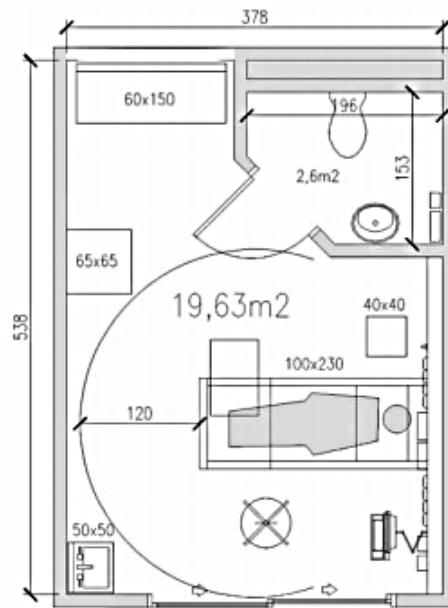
Floor plan of a single room, Cardiology, *ICU* (Bakanlıđı, 2010, p 83)
